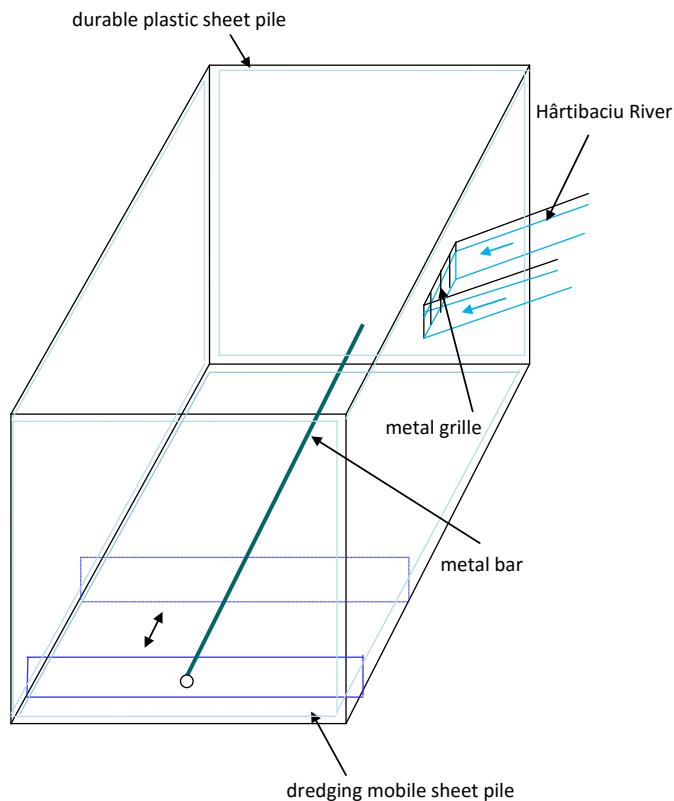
Positioning the rectangular basin and the dredging mobile sheet pile – scheme.
